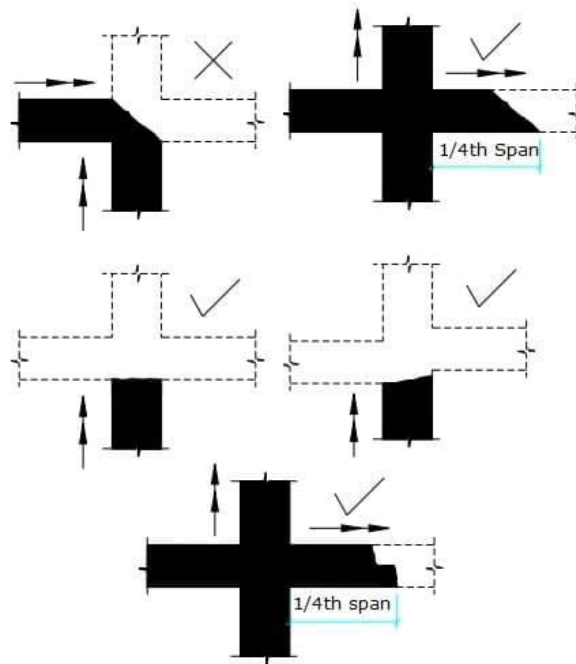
Typical Construction Joint in Beams and Beam-Column Joint
